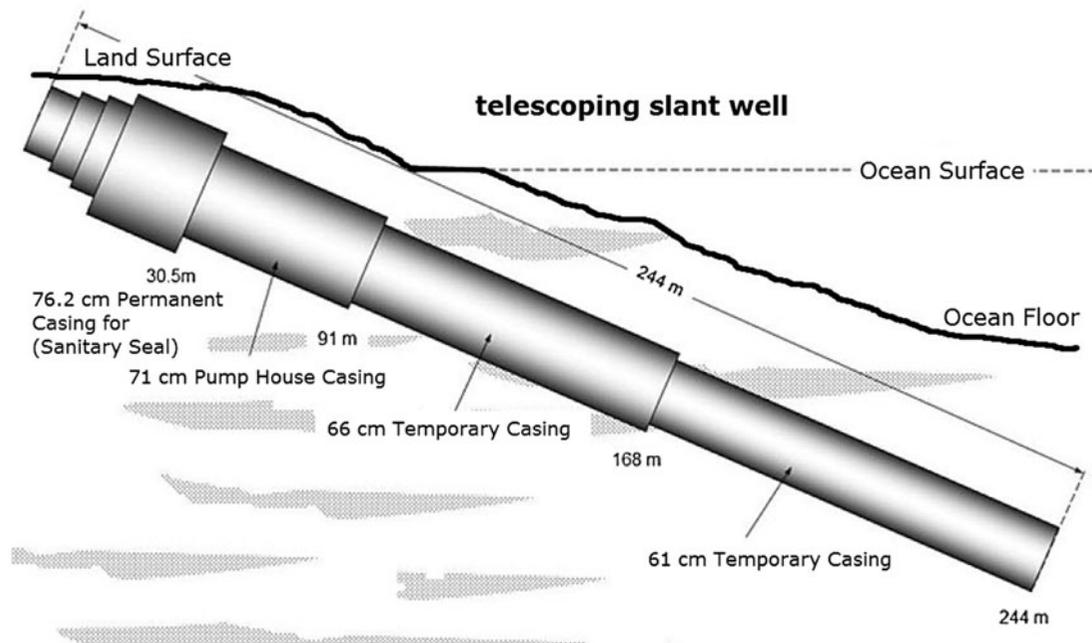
Telescoping design showing larger pump house casing used in the Monterey test slant well [28].
